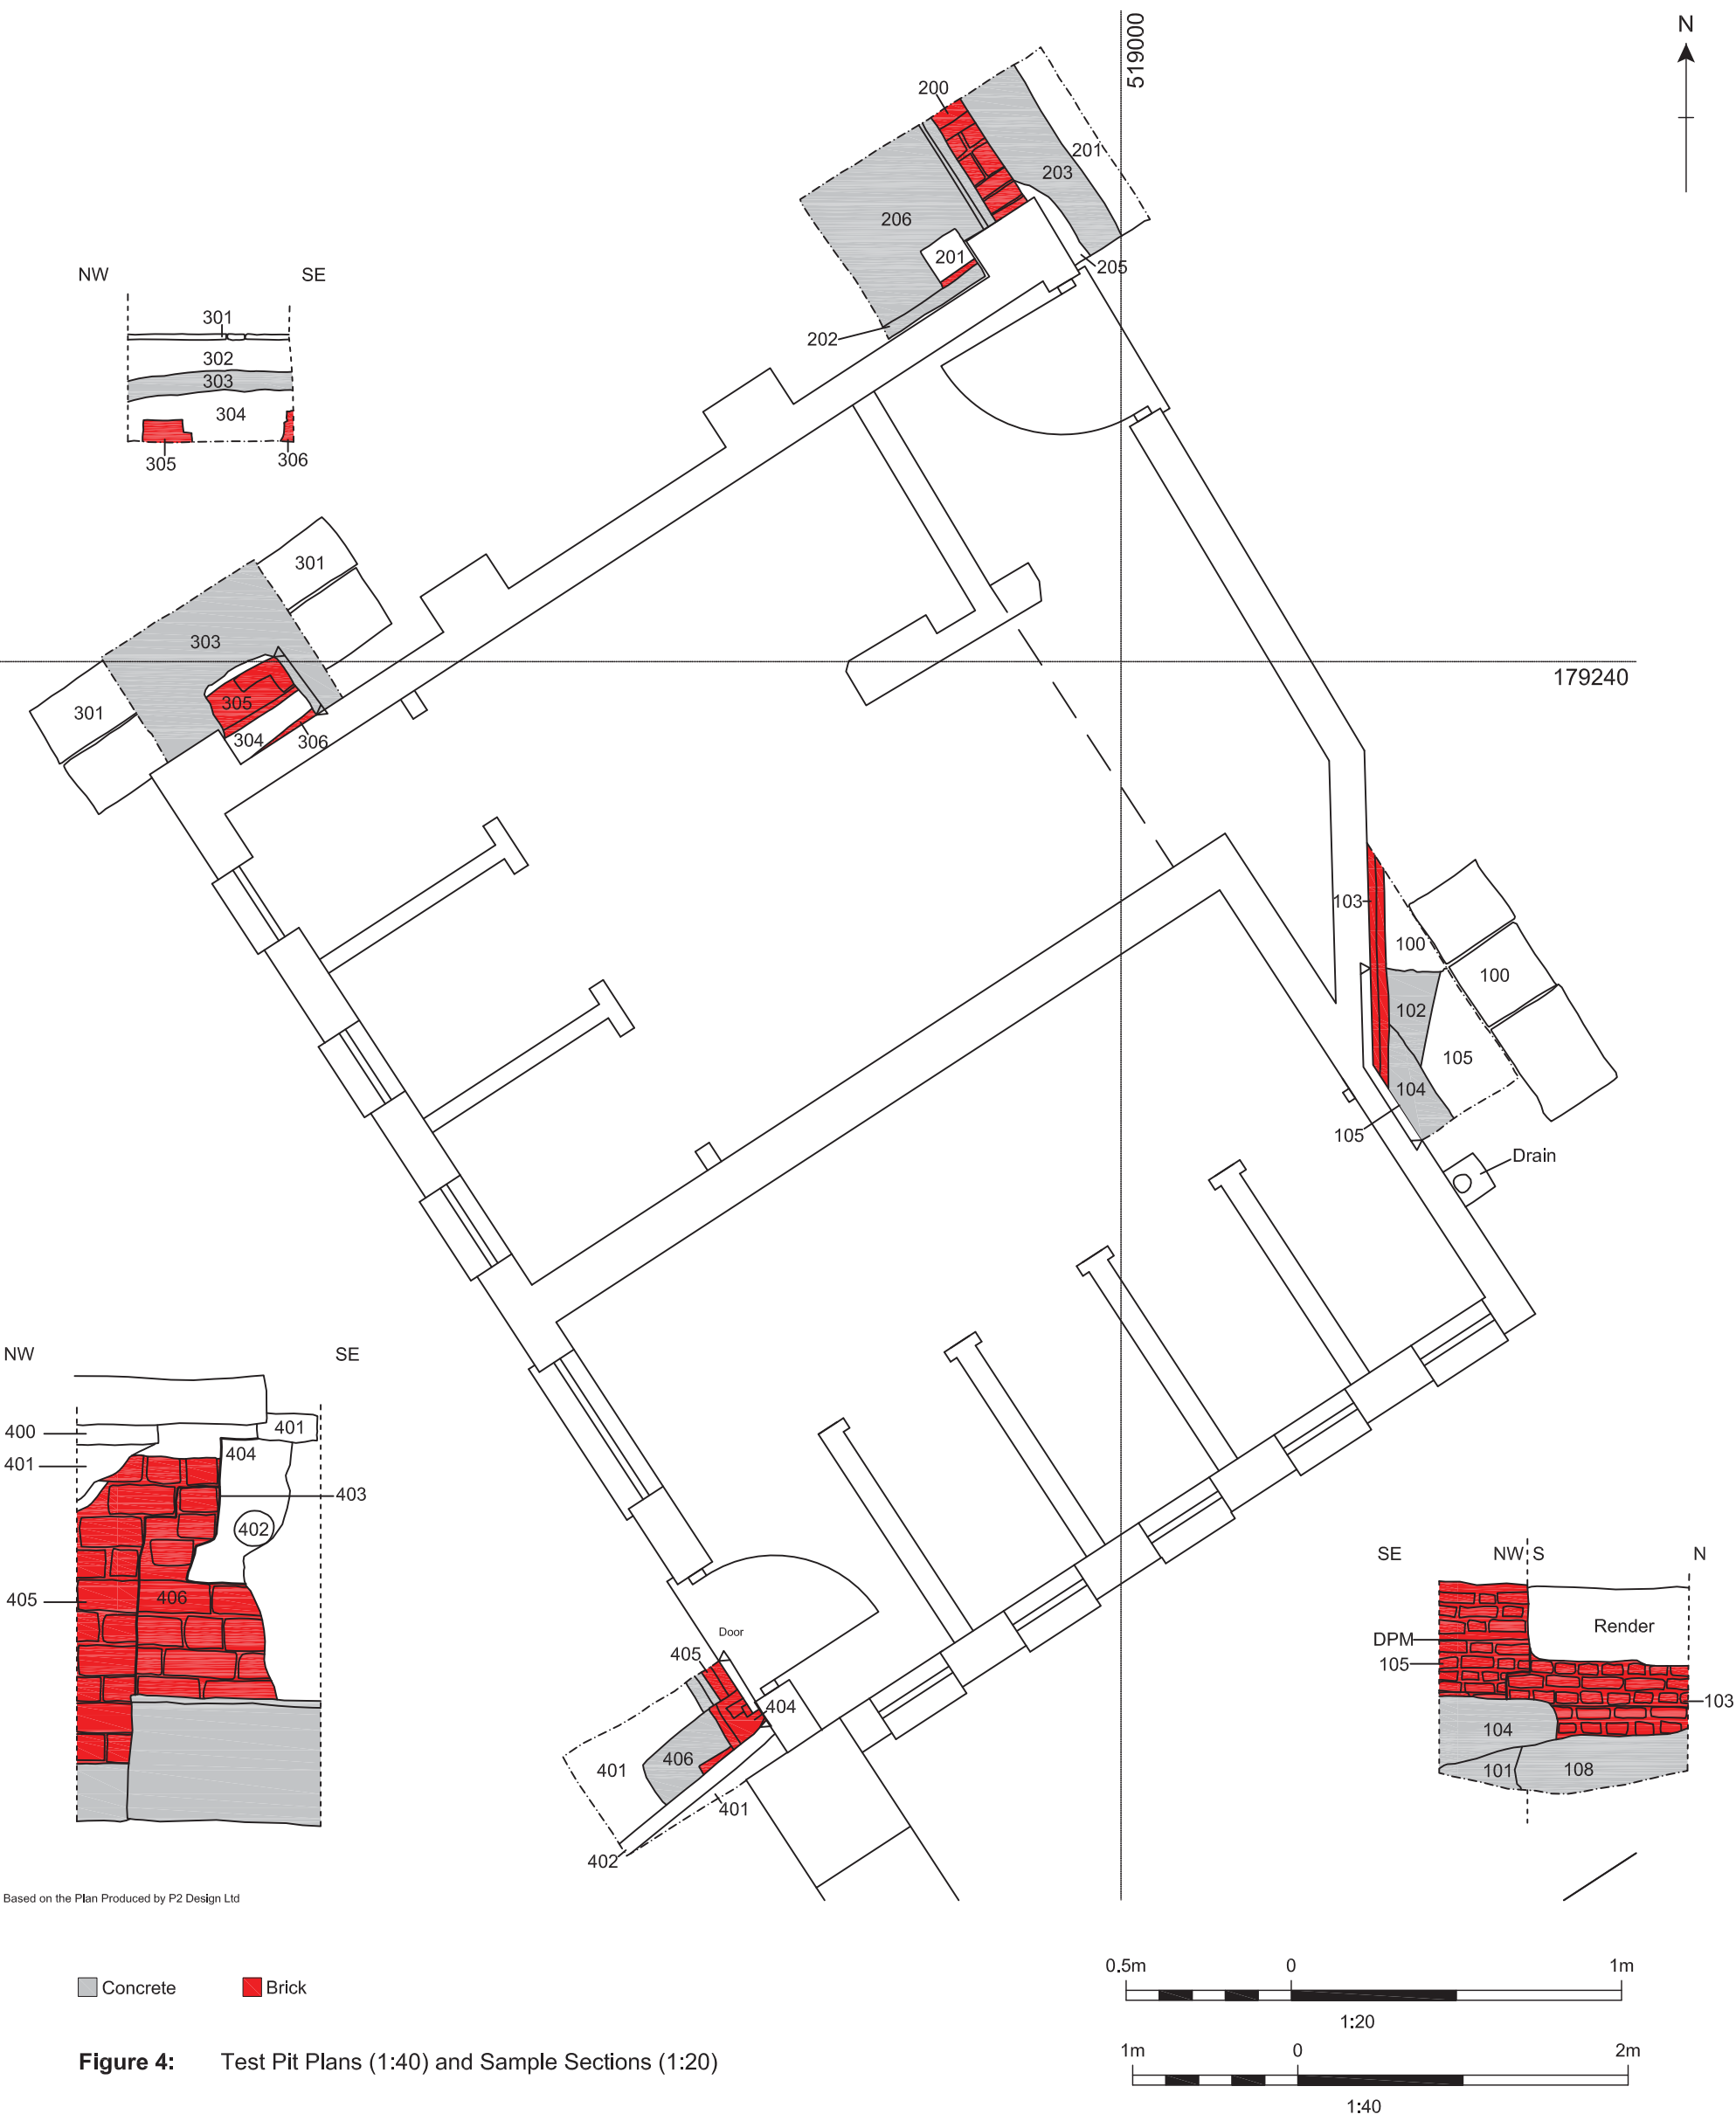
Test Pit Plans (1:40) and Sample Sections (1:20)
